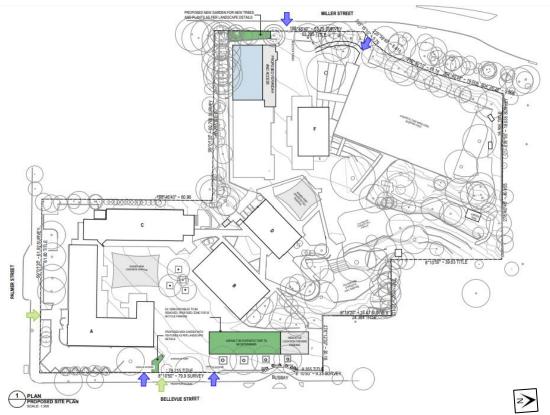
Proposed Site Plan for upgrade of Cammeray Public School. Shows construction of new block next to block E (indicated in blue). Source: Fulton Trotter Architects, Rev 06.
